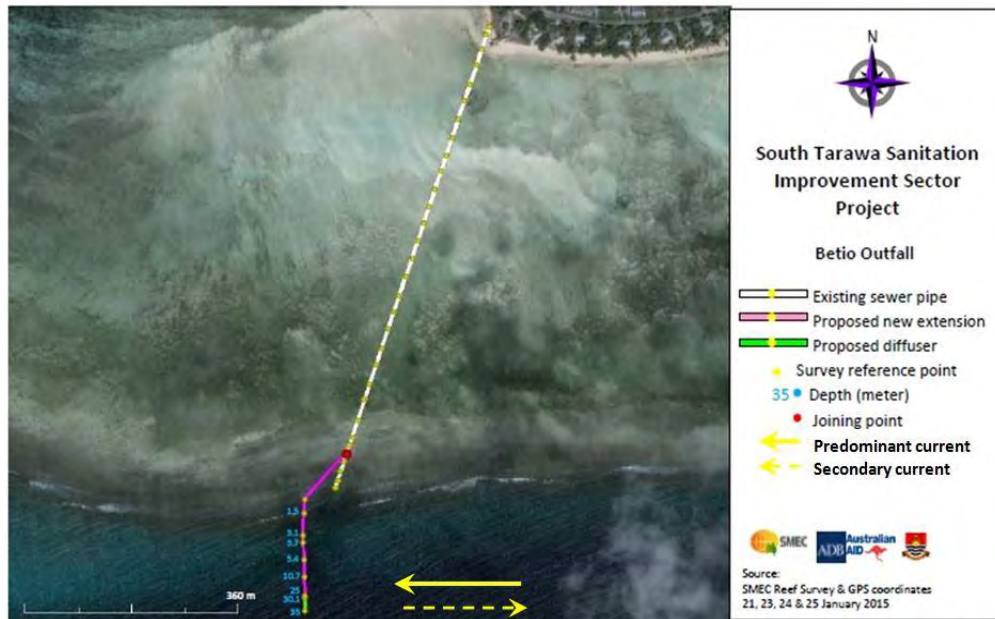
Existing Outfall Pipe and Proposed Extension at Betio
